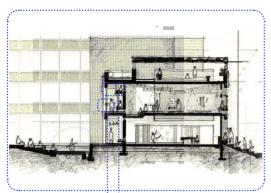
Portion of longitudinal spatial section. (Author: October 2013)
